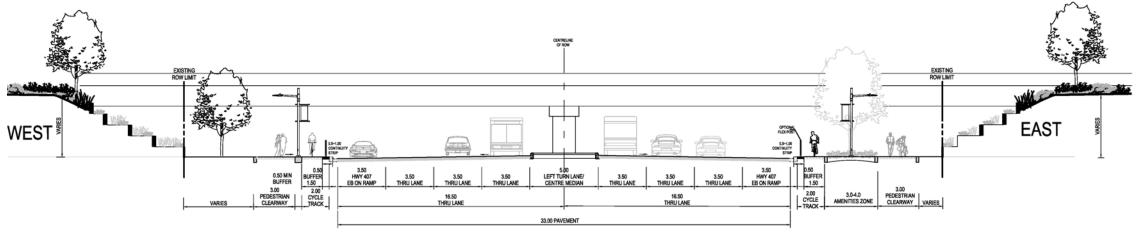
Concept C | Section I-I Approaching 407 @ Langstaff Road East
